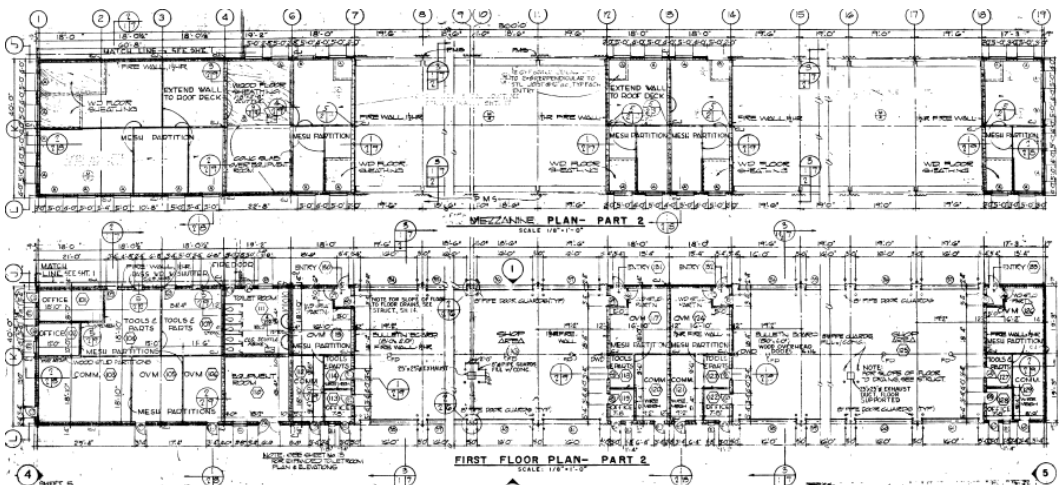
Tactical Equipment Maintenance Facility floor plan. Bldg 3492, Fort Carson, CO.
